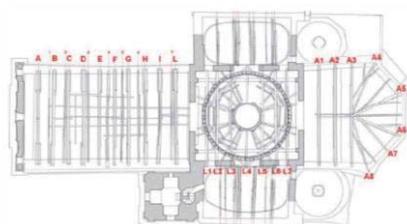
The roof planimetry: the red letters refer to the position of the wooden structures
